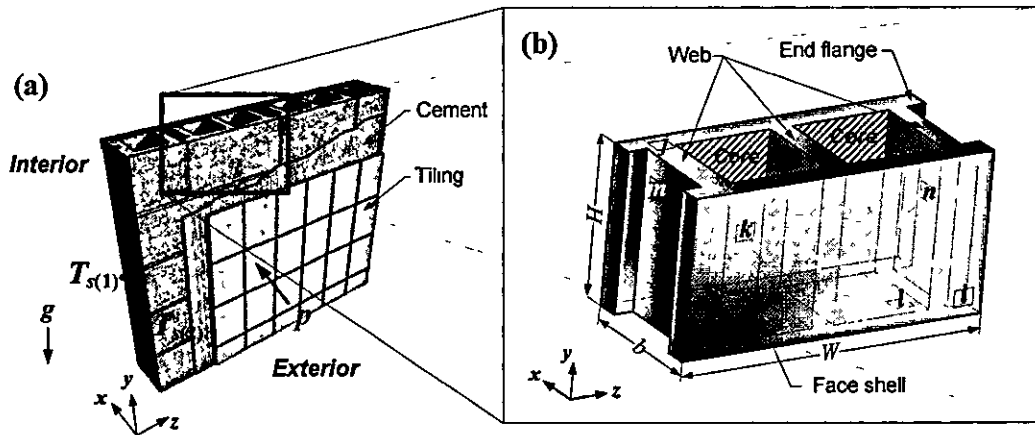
Typical example of modular concrete masonry unit (CMU) load bearing wall: (a) Rectangular 'split-core' CMU wall structure, (b) enlarged view of split-core modular CMU. (P denotes pressure loads)
